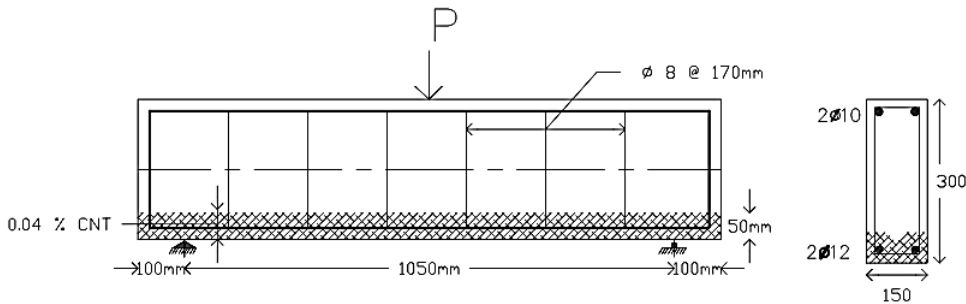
Reinforcement details of non-prestressed concrete beams with CNT
